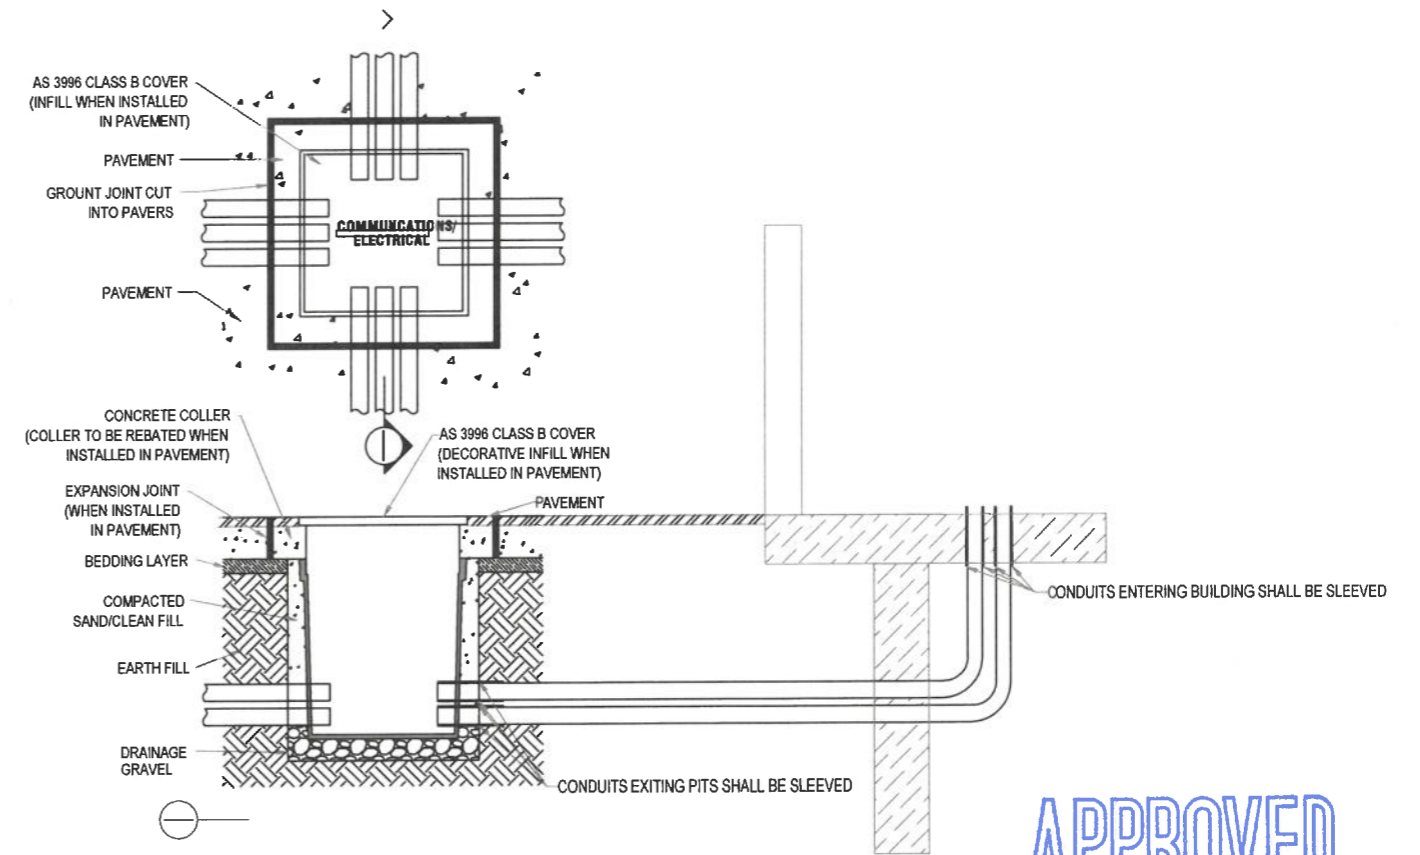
DETAIL APPLICABLE TO CATEGORY 'A' WIRING SYSTEM (AS/NZS 3000:2007) AND AS/CA 5009. REFER TO SPECIFICATION FOR TRENCHING AND BACKFILLING REQUIREMENTS. ALL UNDERGROUND WIRING SYSTEMS SHALL BE SPACED NOT LESS THAN 100mm FROM OTHER UNDERGROUND SERVICES.
